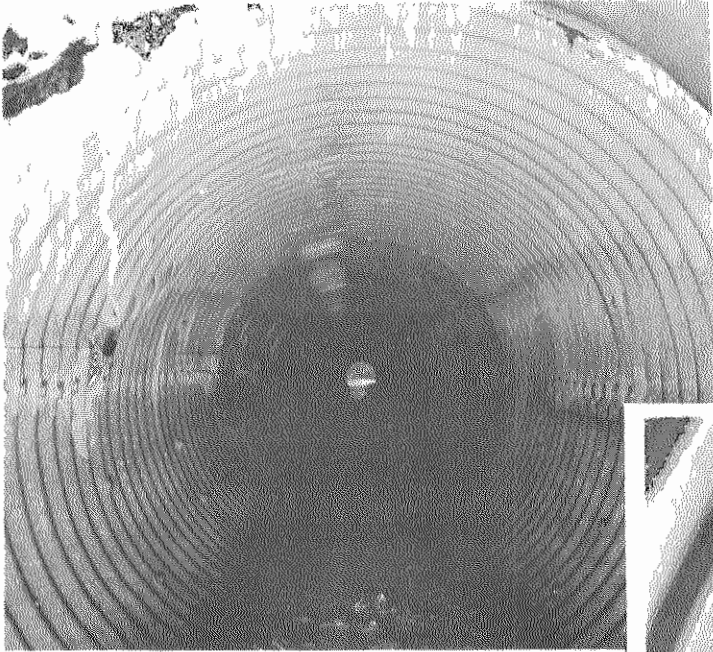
Galvanized steel culvert, Sta. 622+00. Upper left portion shows area of white corrosion.
